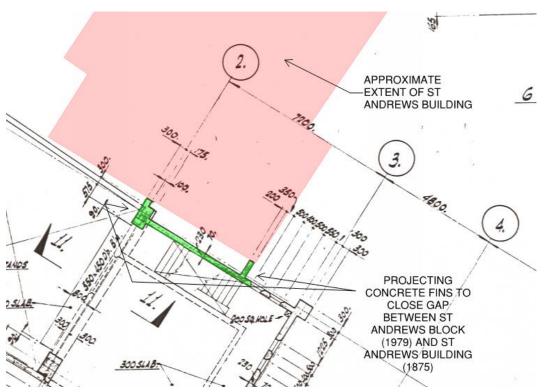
Above ground interface between St Andrews Building and St Andrews Block
